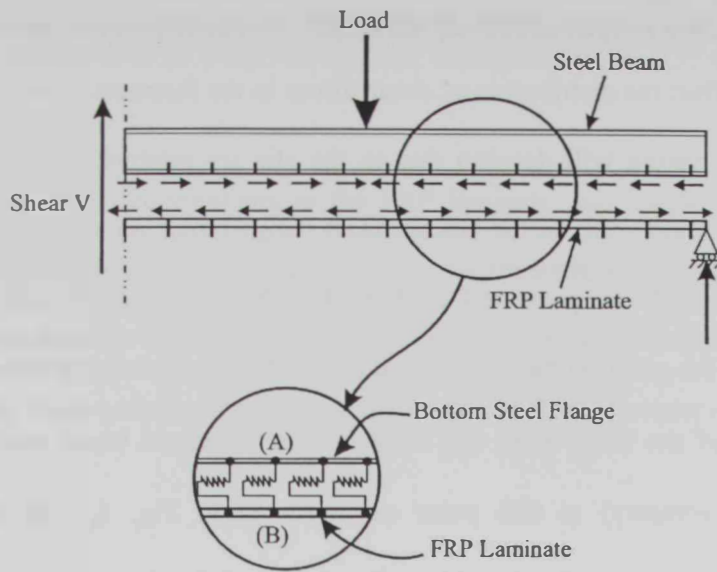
Spring Model of Fasteners in the Steel-FRP Composite Beam
